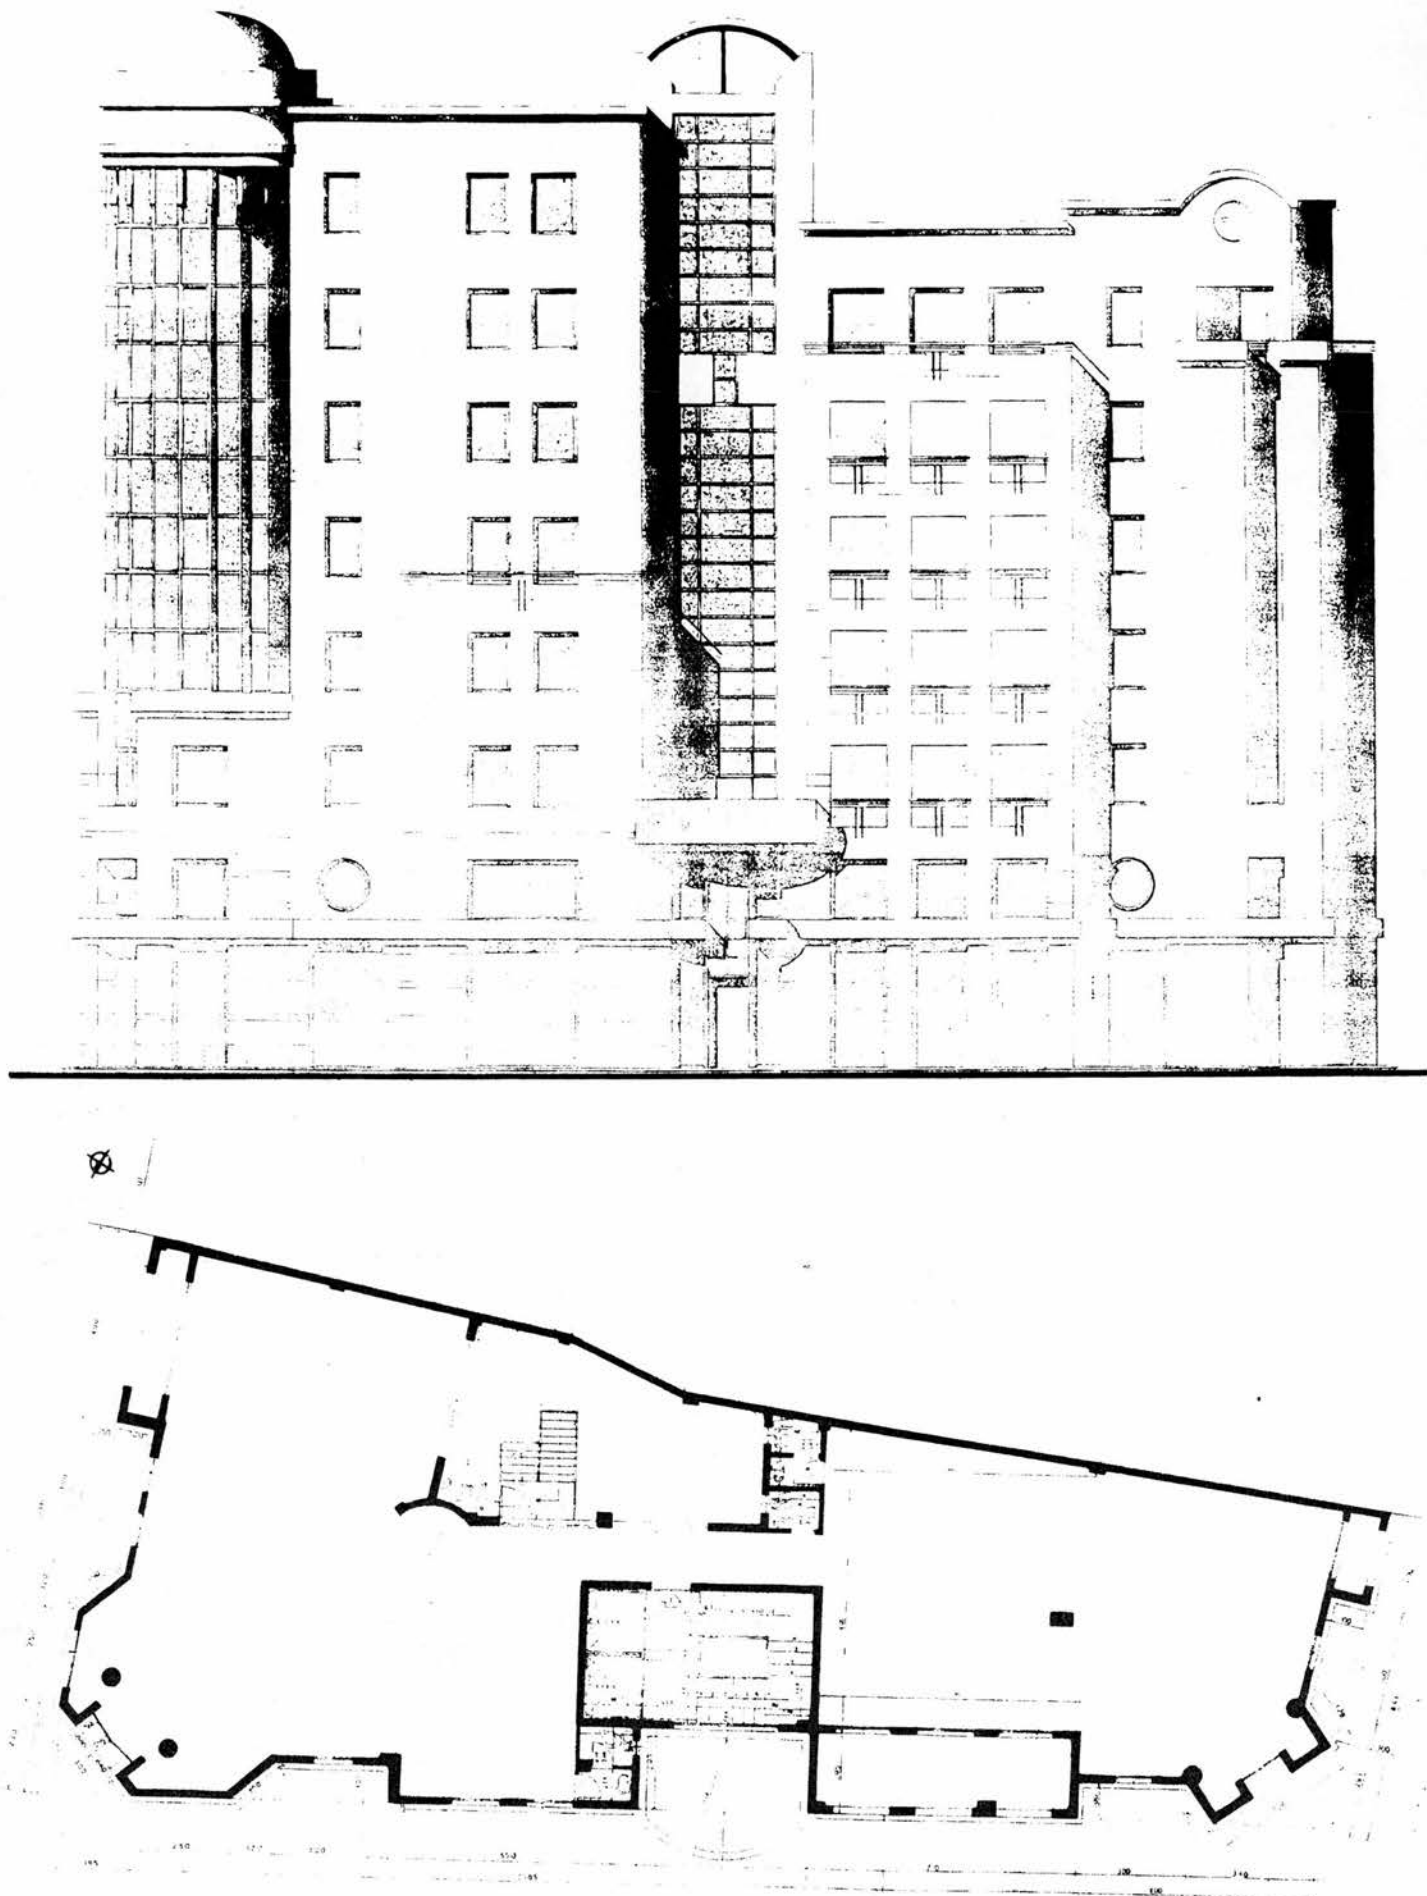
Plan and north street facade of building 1 (scale 1:200)
